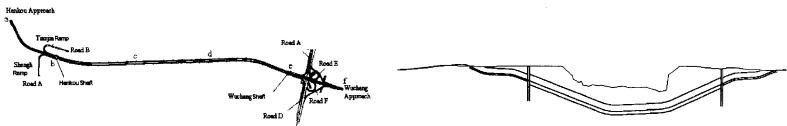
Horizontal alignment and longitudinal profile of Wuhan Yangtze River Tunnel
